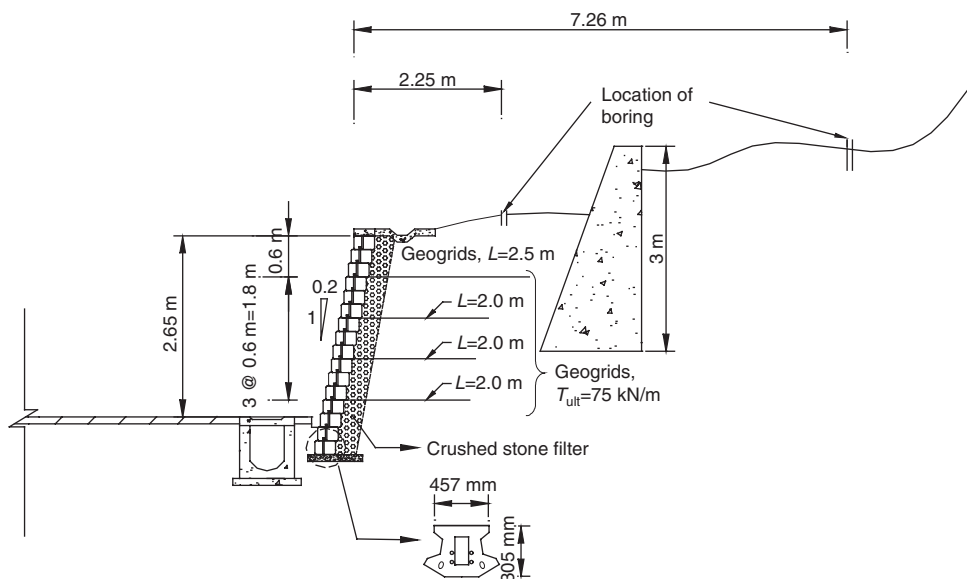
Cross-section of lightly damaged (or intact) GRS-MB at site 3
